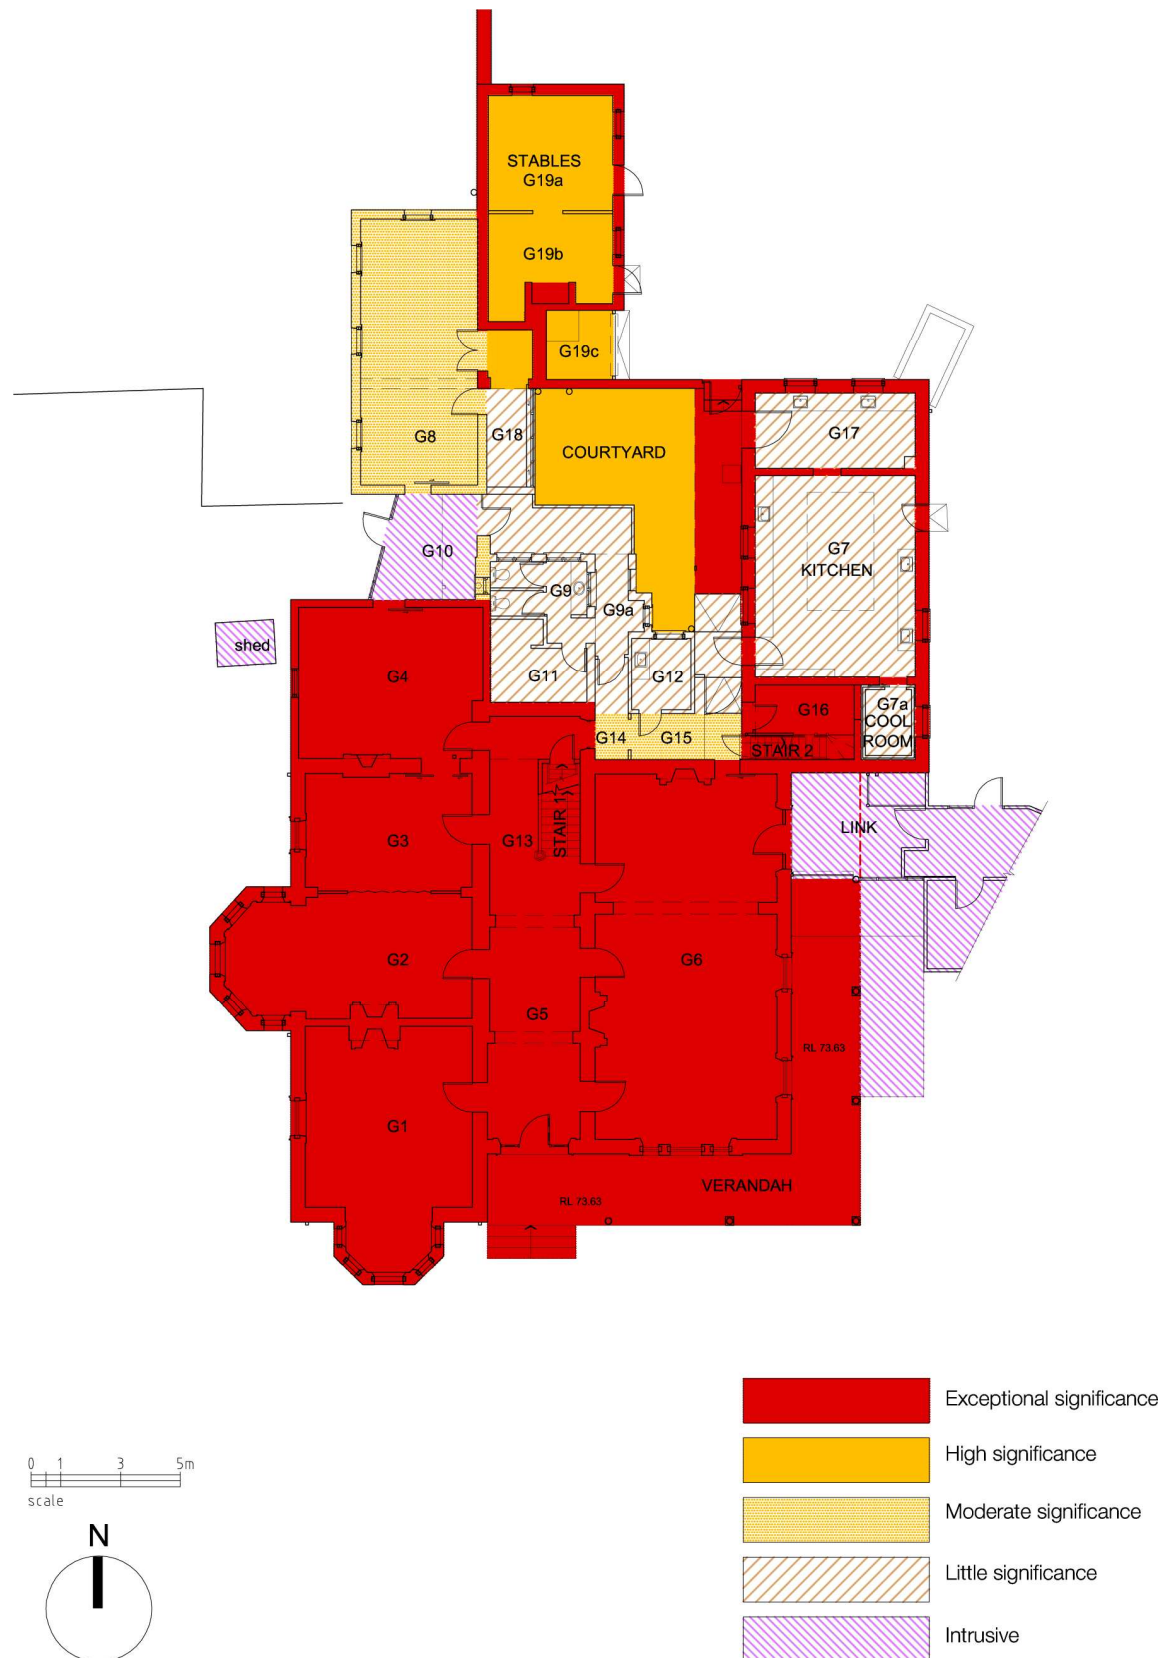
Ground floor plan of Graythwaite House, levels of significance. Not to scale.
